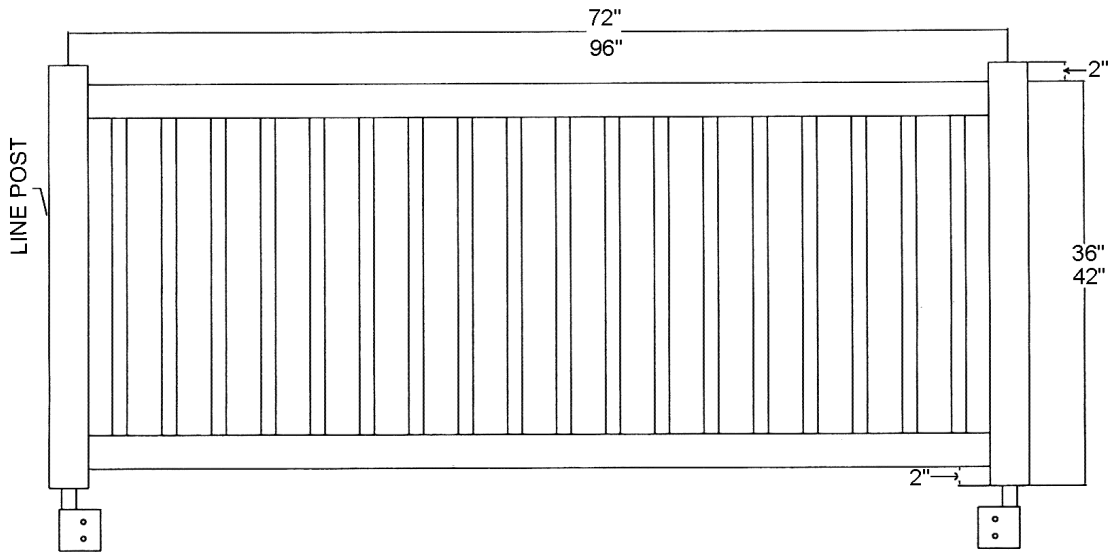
TYPICAL TECK DECK GUARDRAIL SYSTEM
